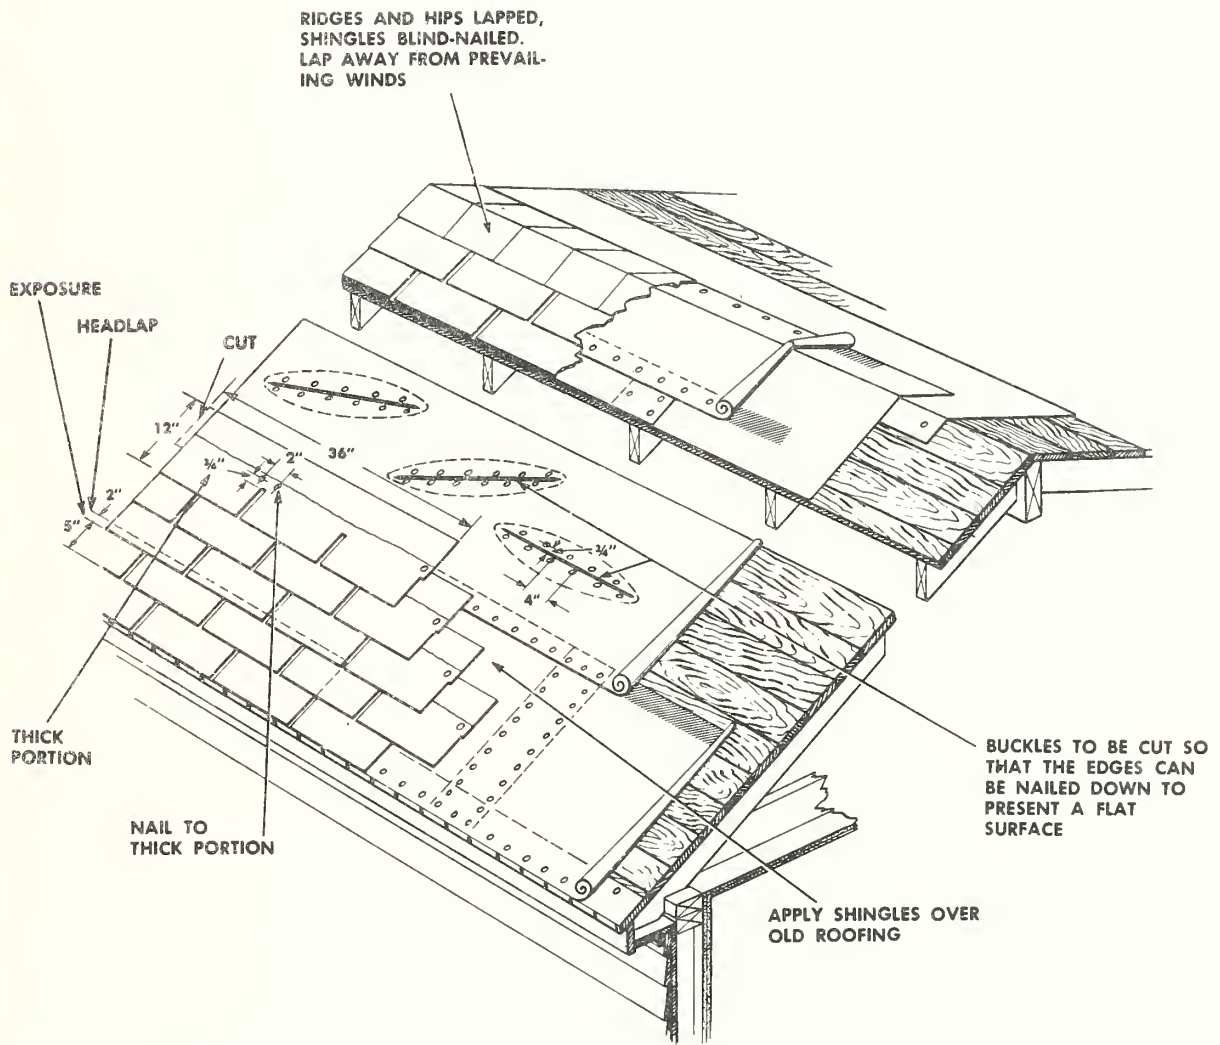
Application of asphalt shingles over asphalt roll roofing.
